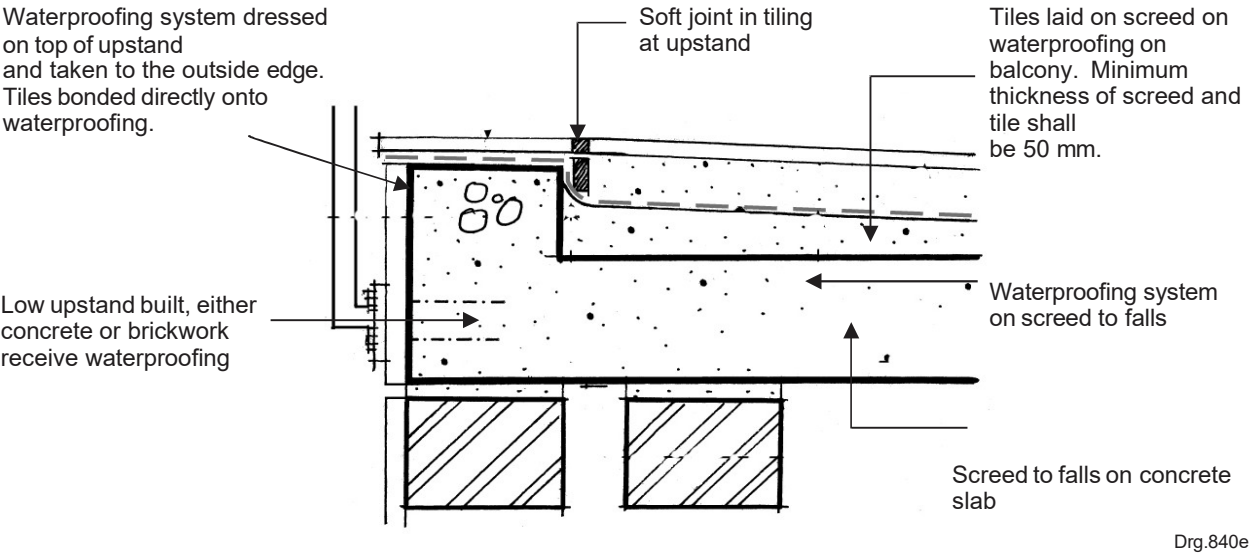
Waterproofing detail at low perimeter upstand at the edge of a balcony
